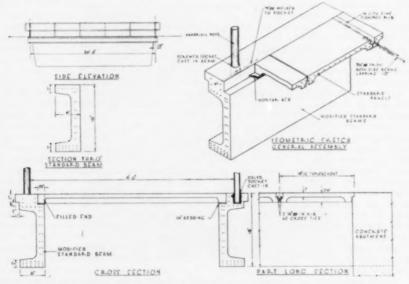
Design for Footbridge with Prestressed Beams and Slabs.
